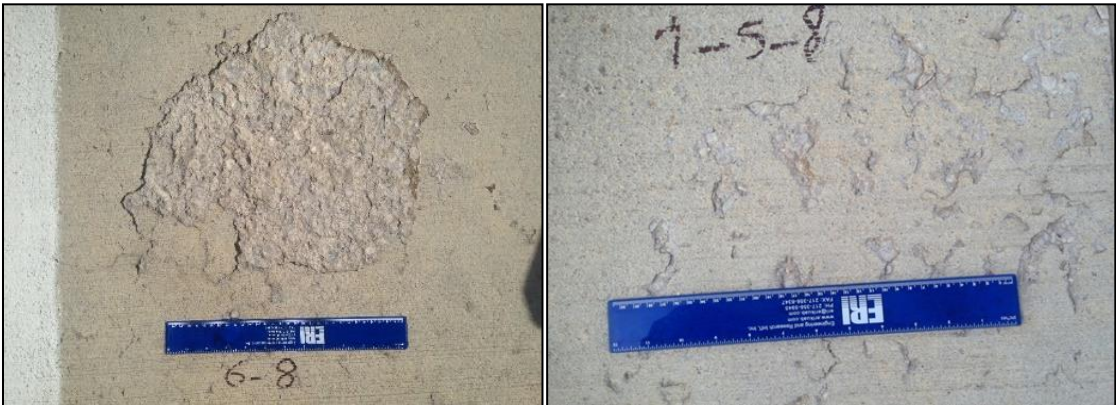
Typical surface scaling on concrete pavements as a result of freeze-thaw cycles and bursting of aggregate particles forming cavities on the concrete surface (Damage at an airport in our country after two years)
